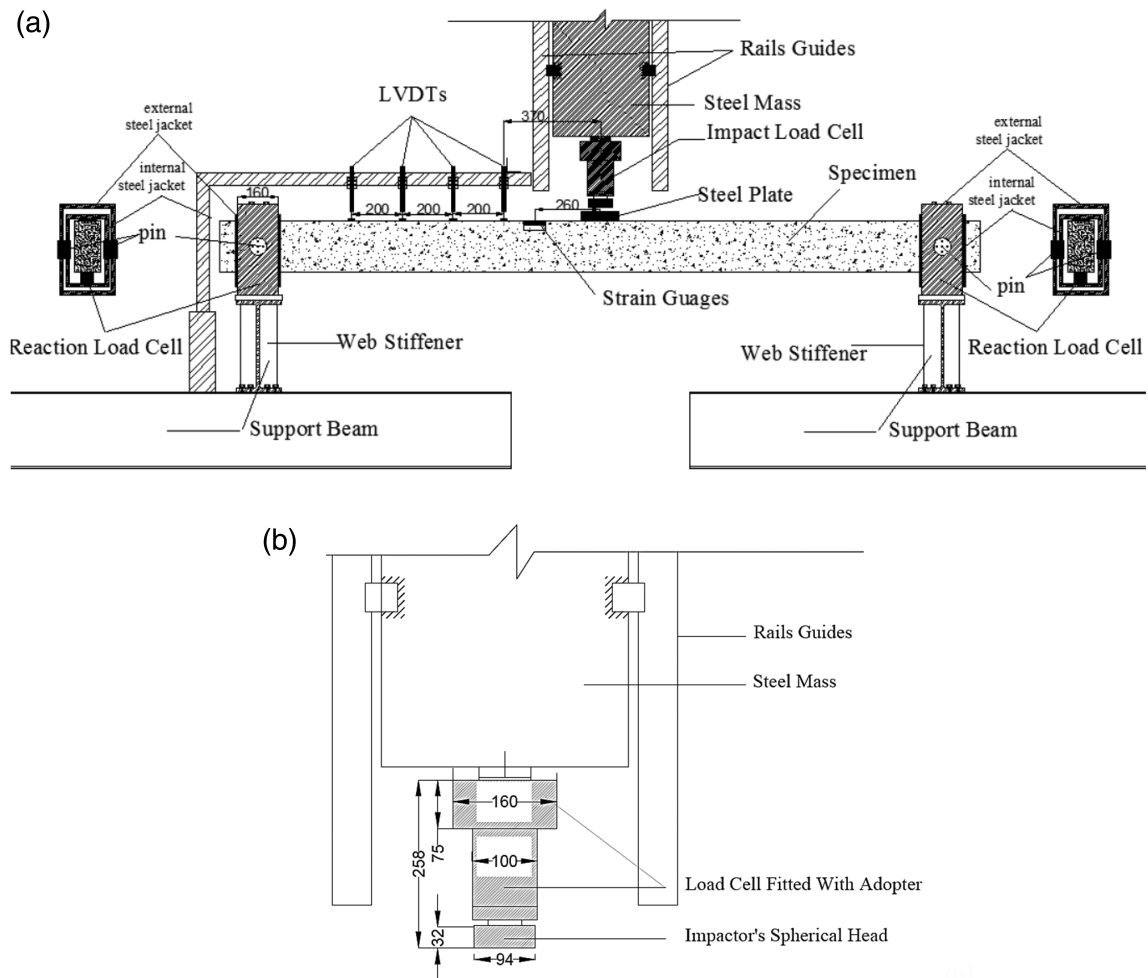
(a) Layout of the experimental setup used for conducting drop-weight testing on the RC beam specimens and (b) detailed drawing of the geometry of the impactor used
